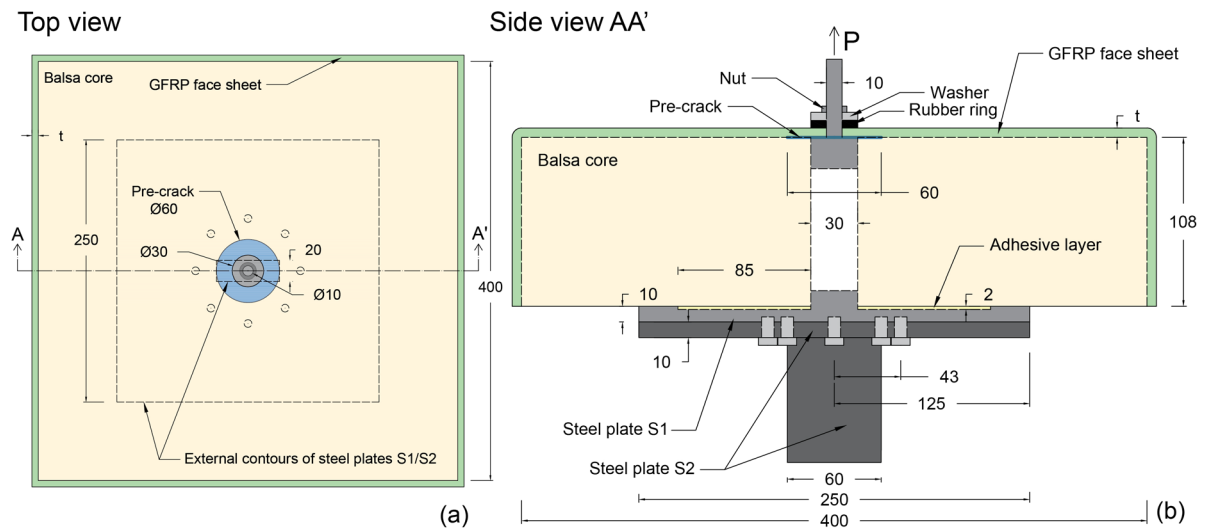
Sandwich panel layout; (a) Top view and (b) Side view of section AA' in (a). Dimensions in mm
